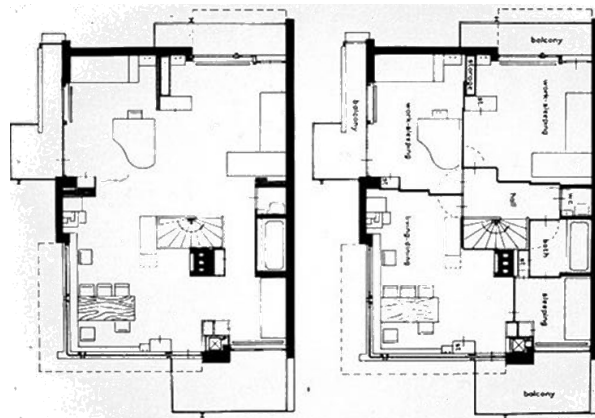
Ground floor and first floor plan, "Schröder Huis", Gerrit Rietveld, 1924.
